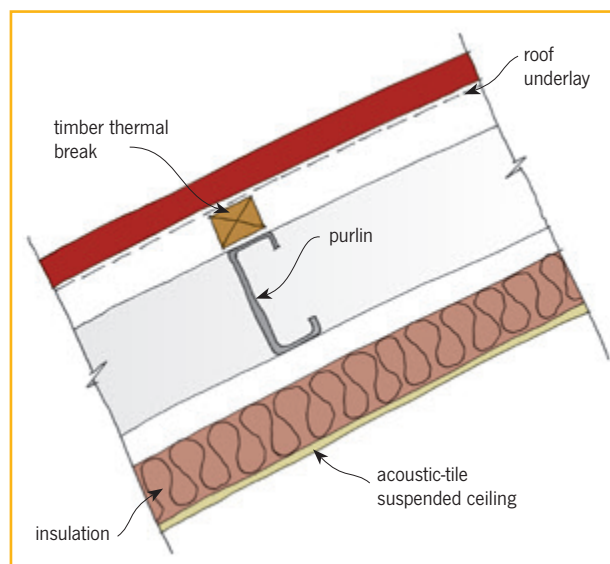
Roof specimen 1: A timber thermal break between the purlin and roof underlay.
